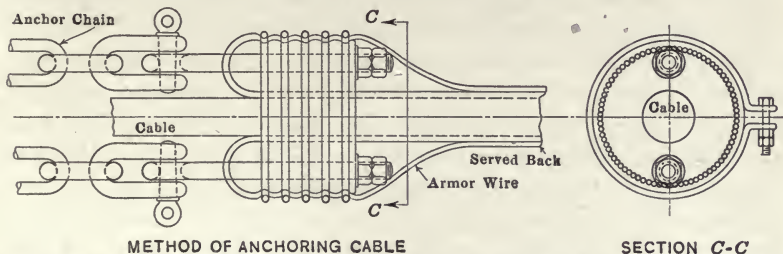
Details of power cable-anchor, showing method of taking the strain on the armor wires.
